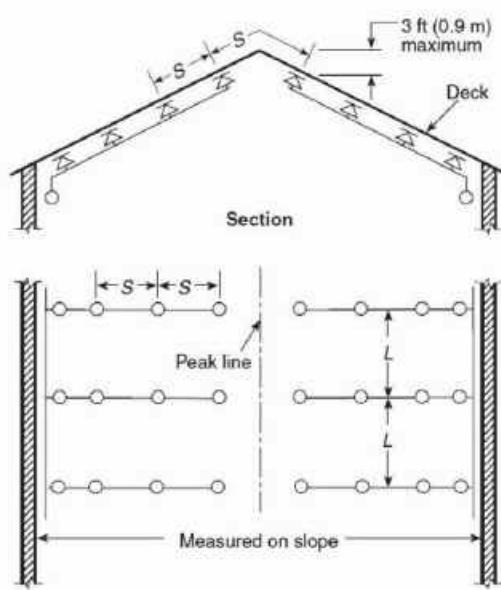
(b) Sprinklers at Pitched Roofs; Branch Lines Run Up the Slope.
